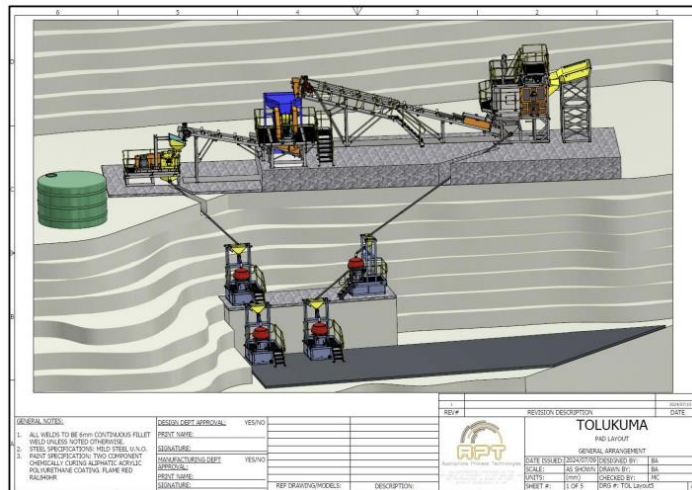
Foundation work has been completed for the gravity plant due for arrival on site in November.
